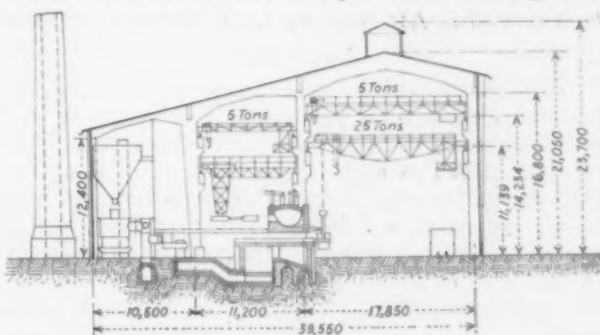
Section in Elevation of Concrete Building for Electric Steel Plant
